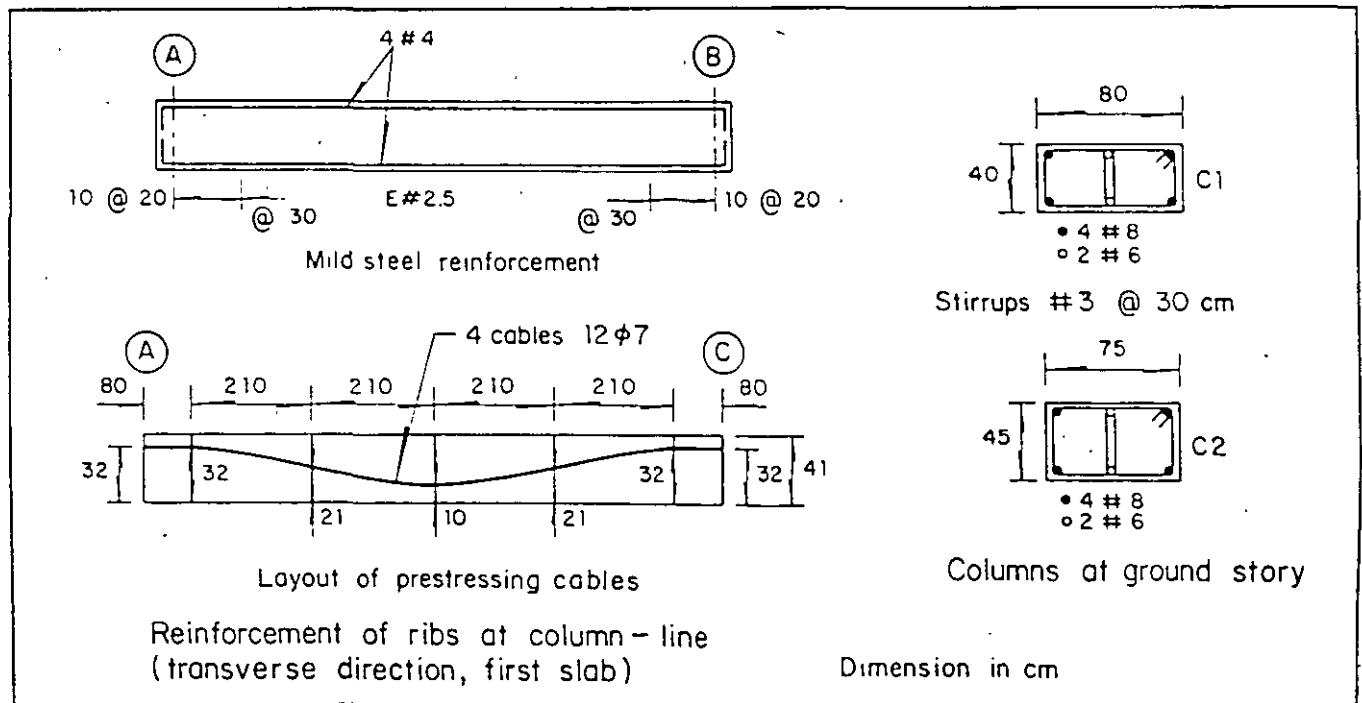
Typical reinforcing details of structural members of the TAM Building.
